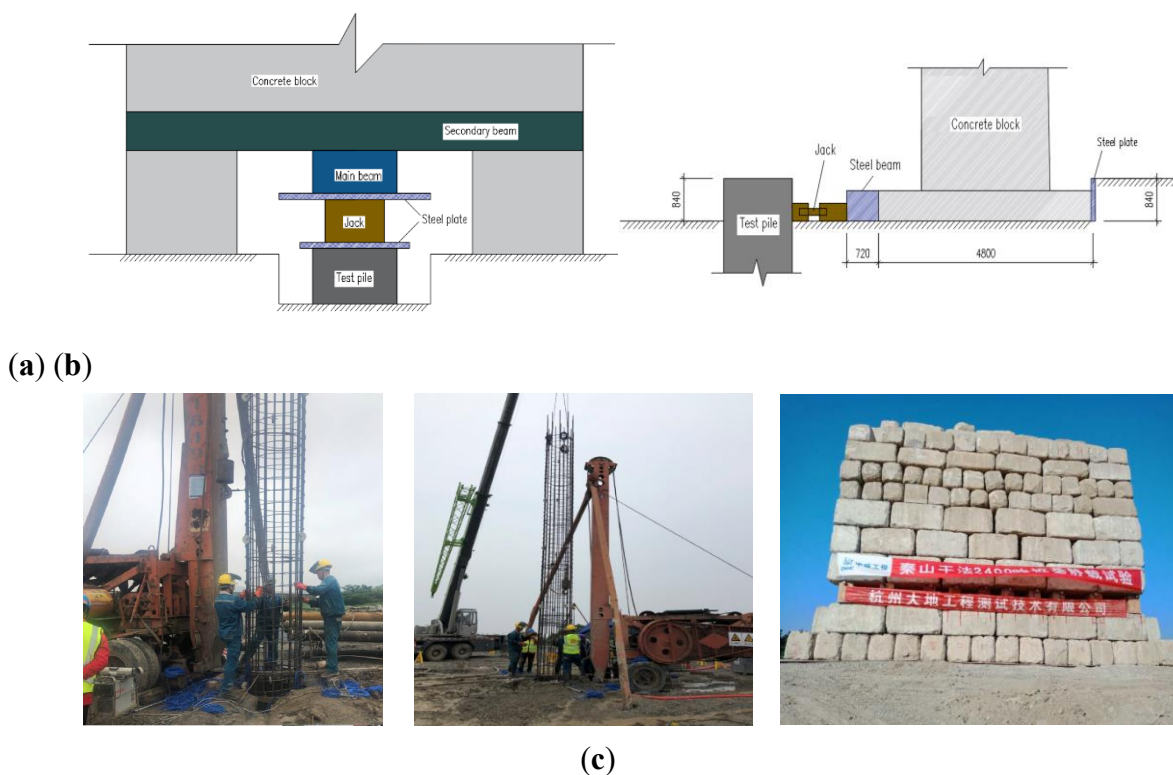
Static load test set-up for single pile: (a) schematic illustration of vertical loading device; (b) schematic illustration of horizontal loading; (c) pile construction and loading blocks in field.
